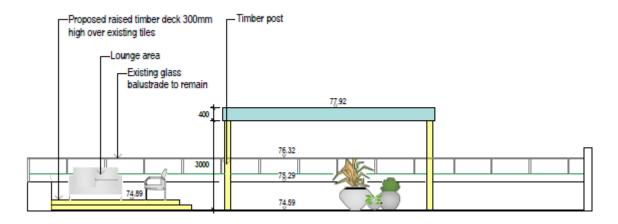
Section EE - Proposed raised decking and pergola looking to the west.
